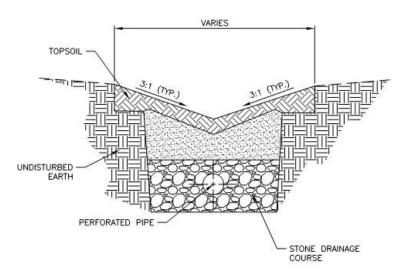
Typical Hybrid Ditch Cross-Section
